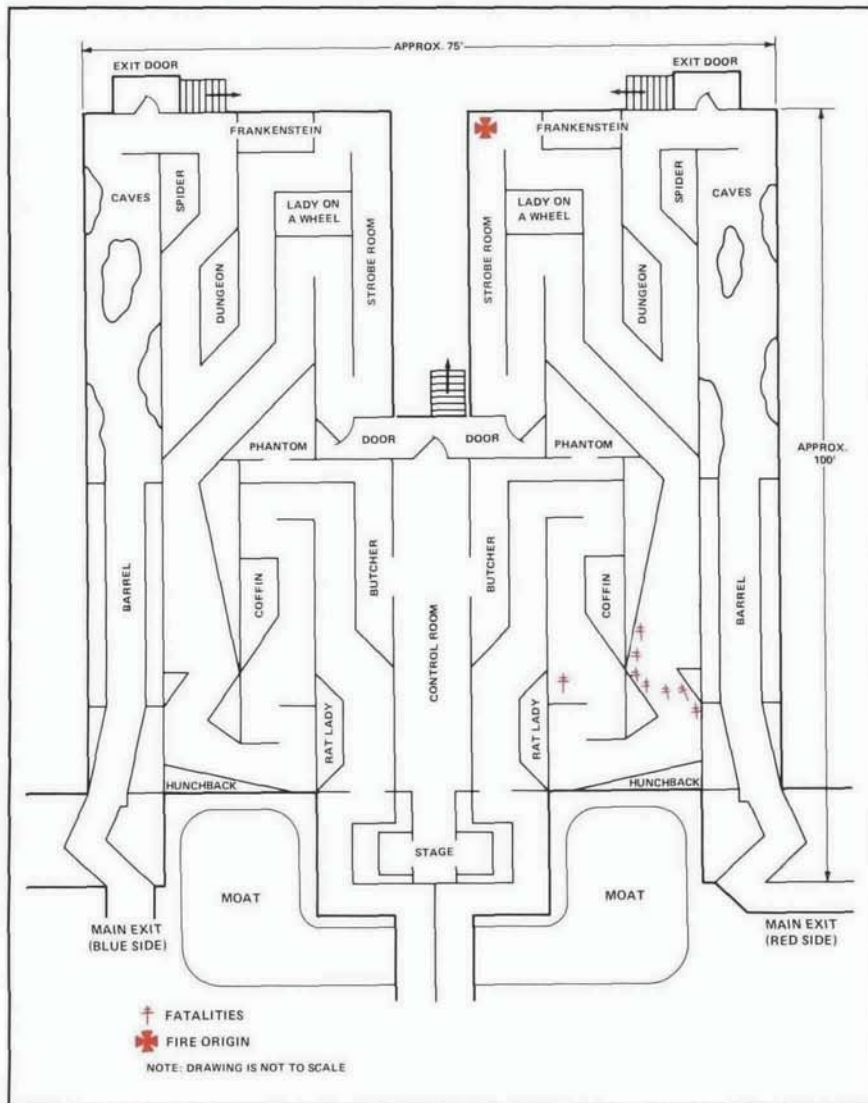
Floor plan of Haunted Castle. Shaded area indicates the Red Side, which was open on the day of the fire.
